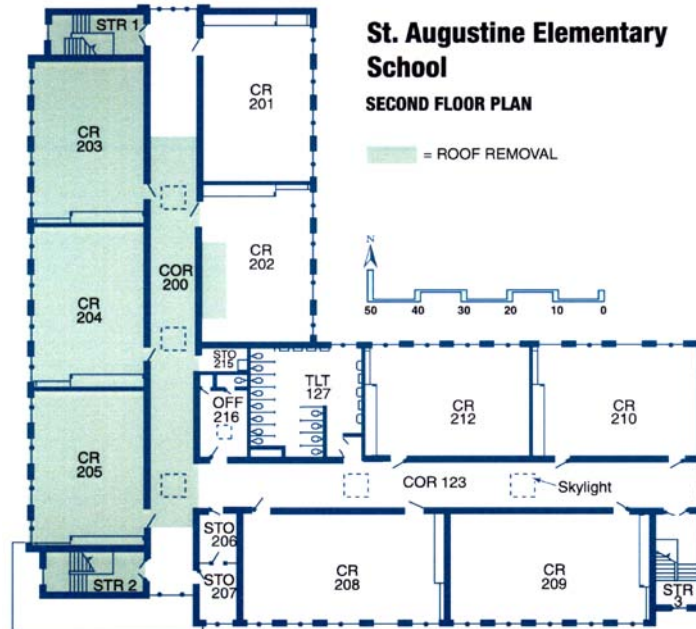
Floor Plan of Second Floor Showing Roof Removal by Tornado
